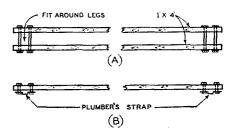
Sketch showing details of wood cross-braces and method of fastening.
